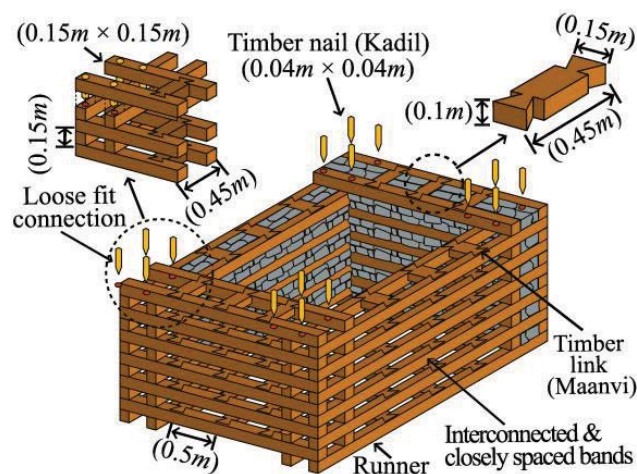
Typical sketch of the load-bearing system of Kath-kunni buildings
